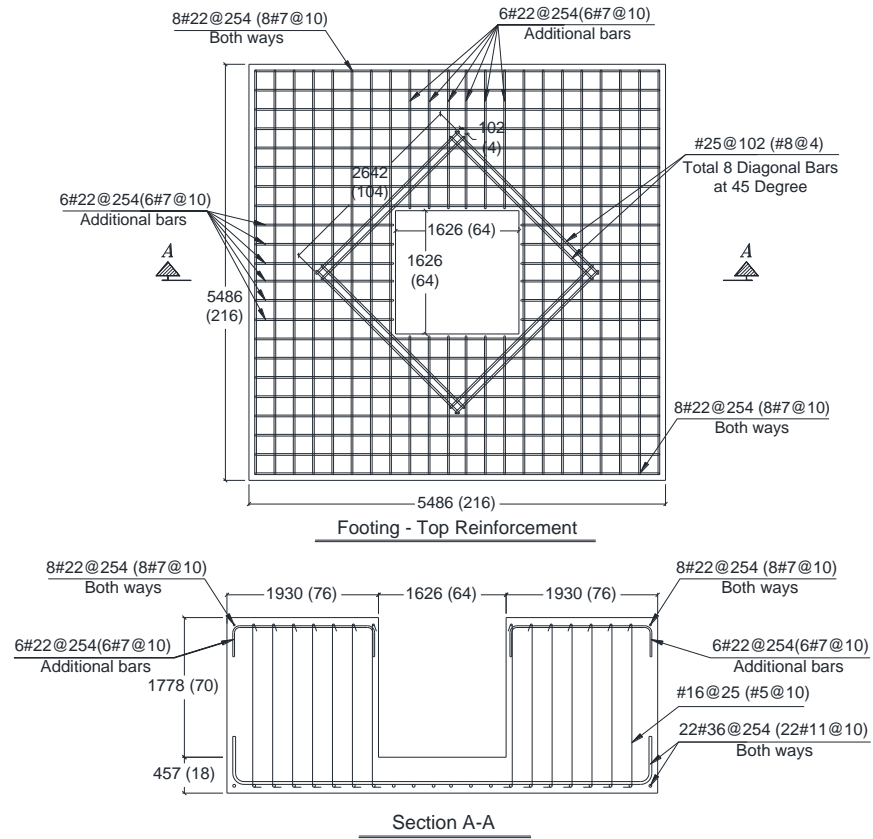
Details of square column-footing pocket connection [units are mm (in)]
